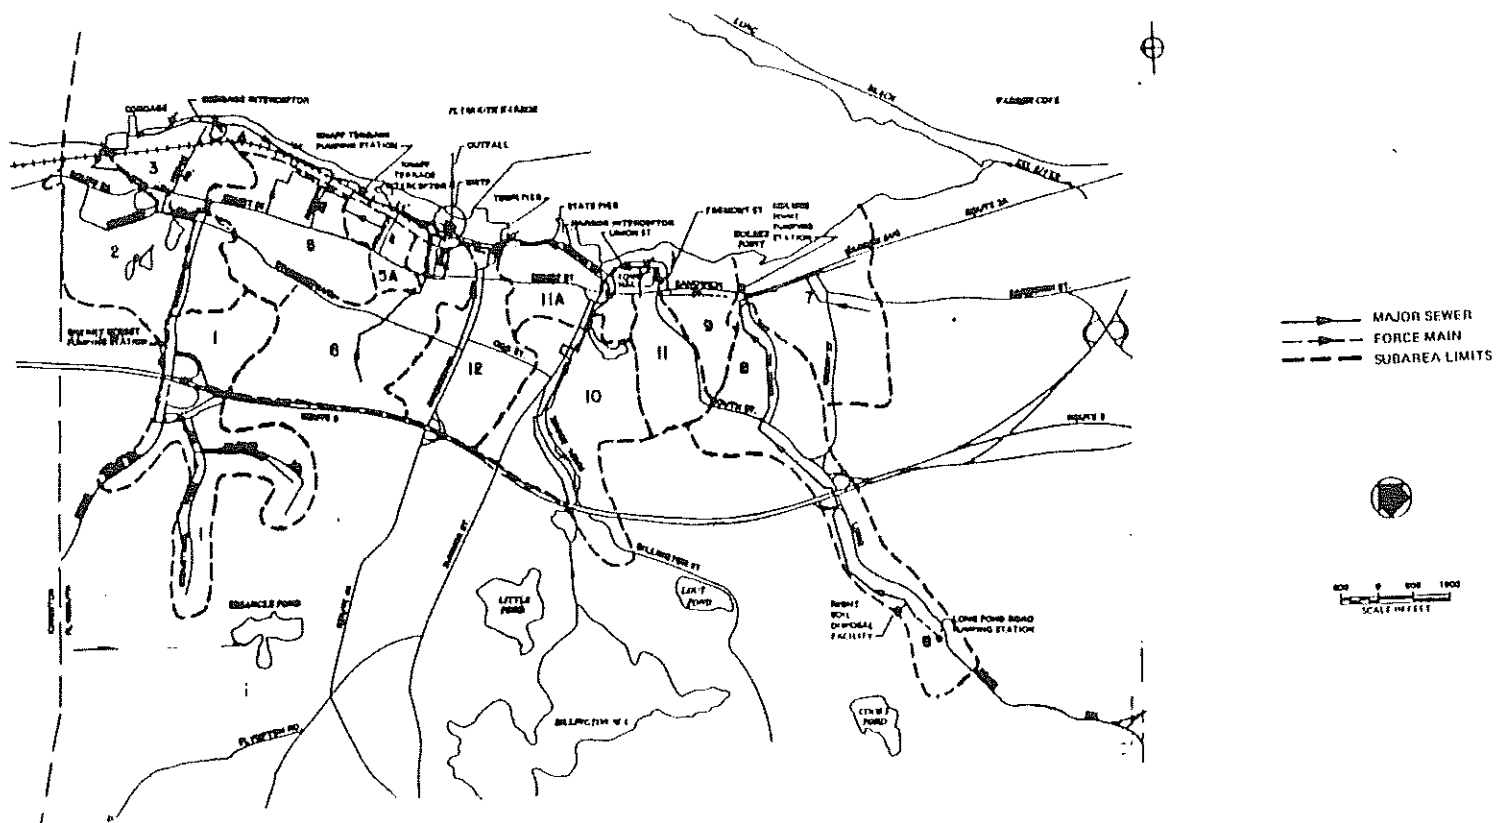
EXISTING WASTEWATER FACILITIES AND SERVICE SUBAREAS
